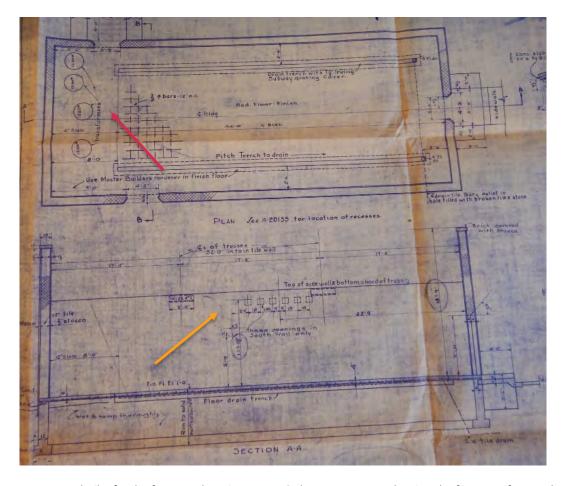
1926 as-builts for the former substation at 498 Del Monte Avenue, showing the four transformers housed at the building (denoted by red arrow) and six electrical openings in the building's southern wall (denoted by yellow arrow).
